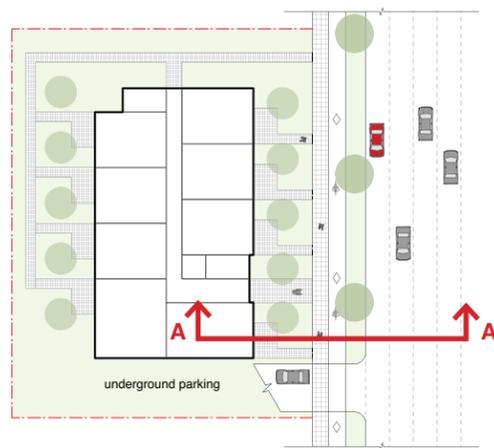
SAMPLE SITE PLAN (not to scale)
